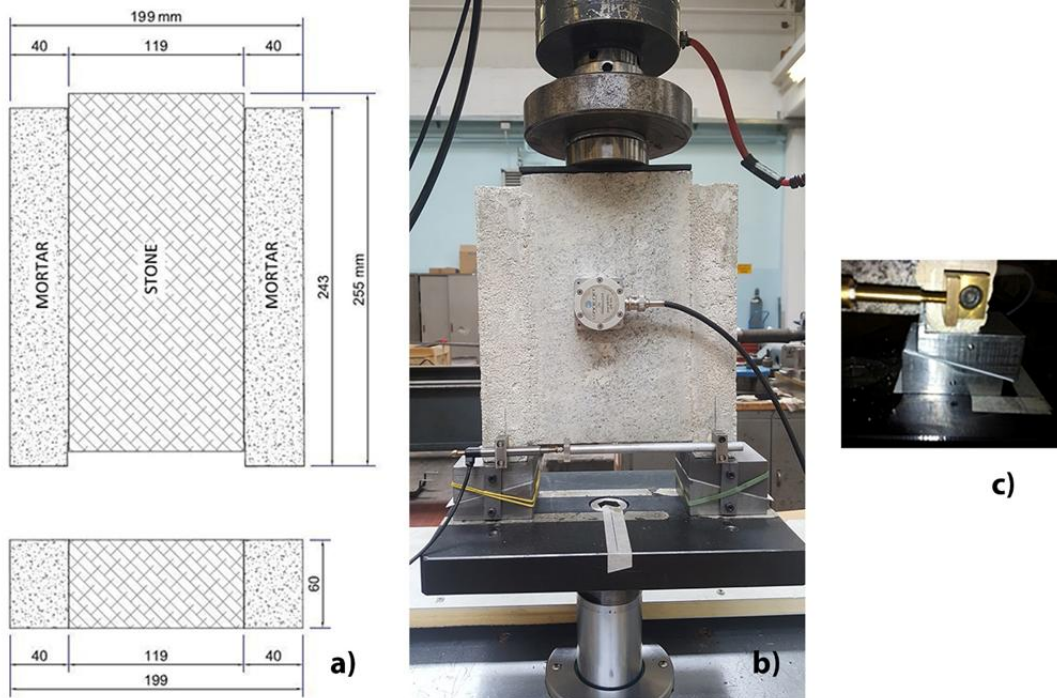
Geometry of composite specimen (a); test setup (b); wedges' geometry (c)
